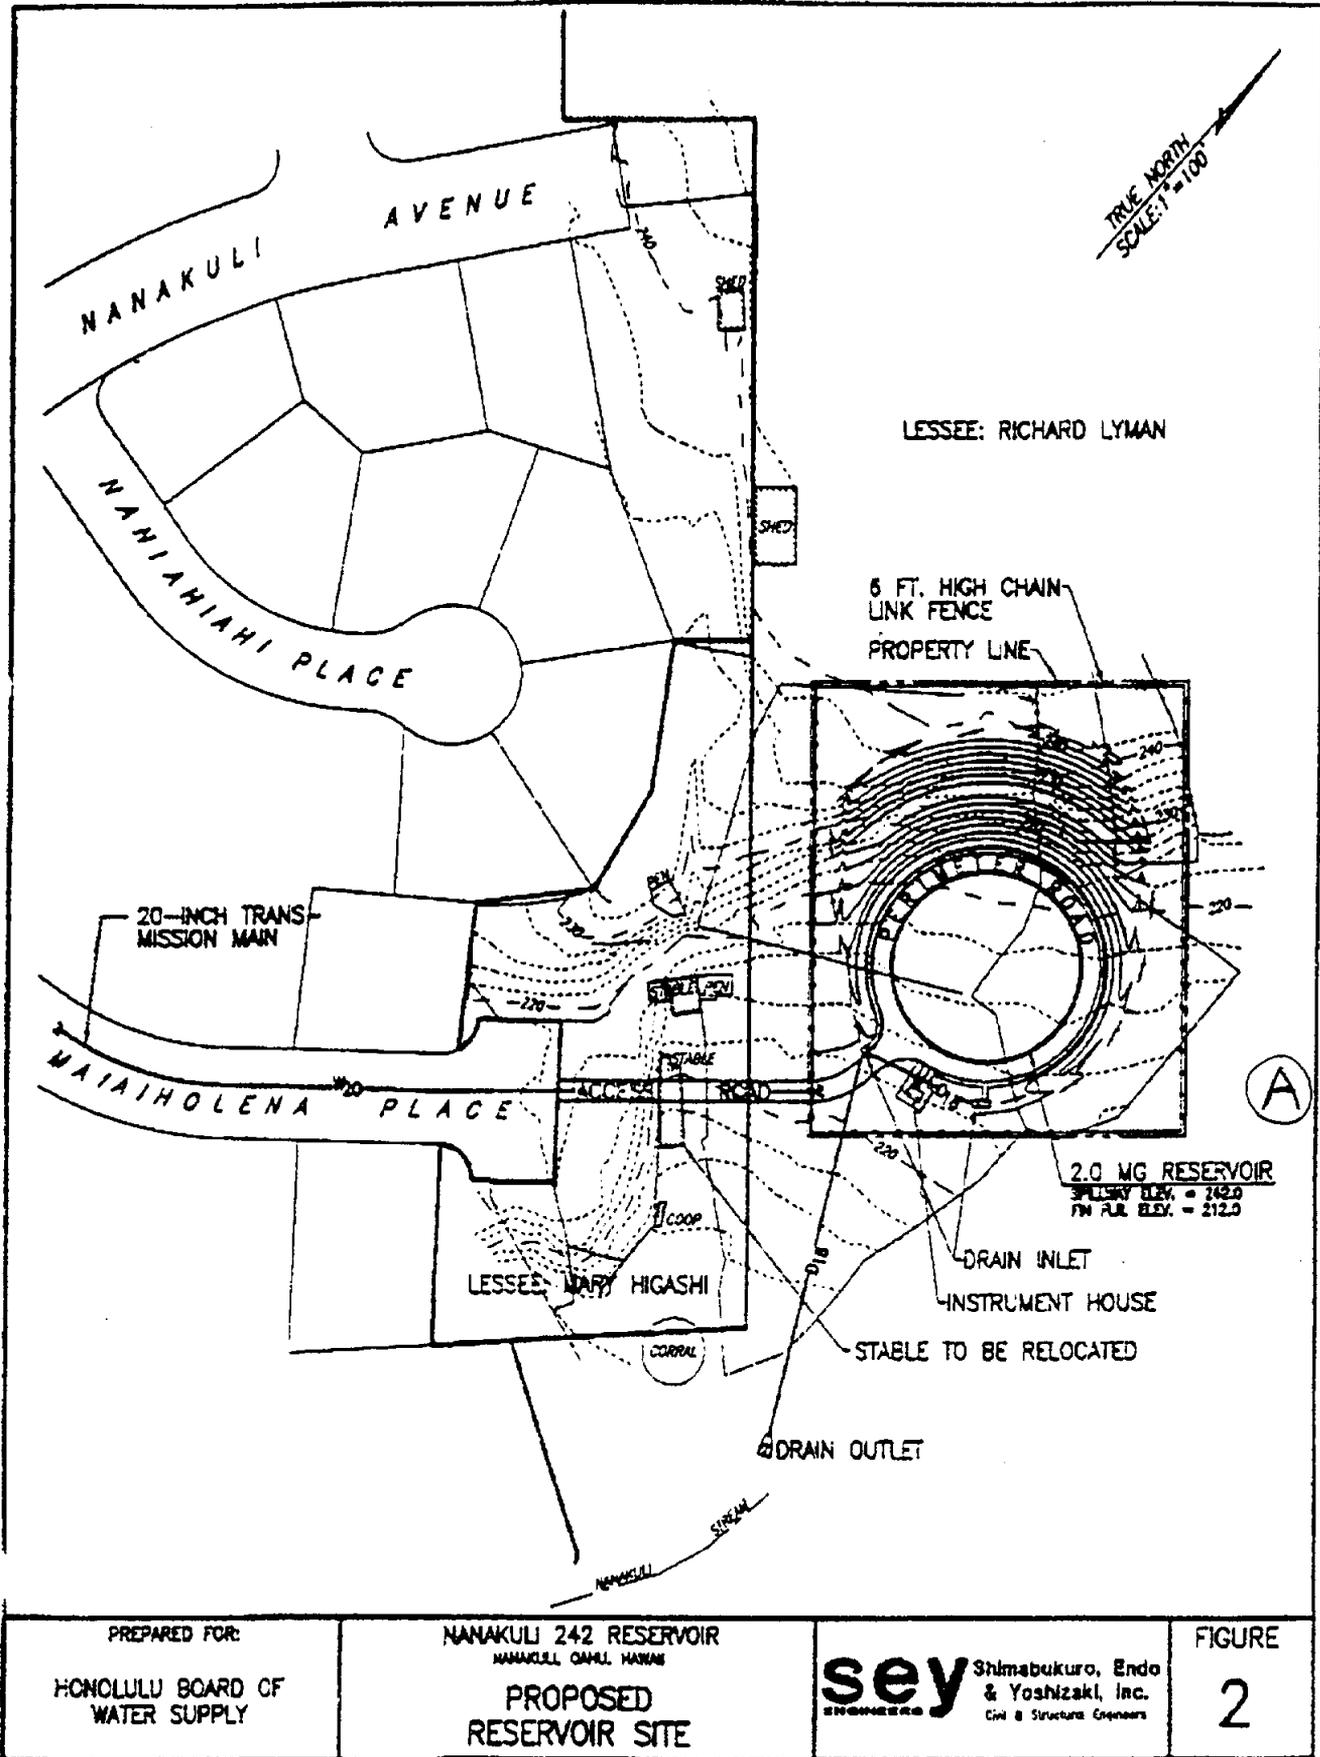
242 Reservoir Construction Site Showing the Location of the Stacked Stone Wall Alignment (Labeled "A") Outside of the Project Area.
